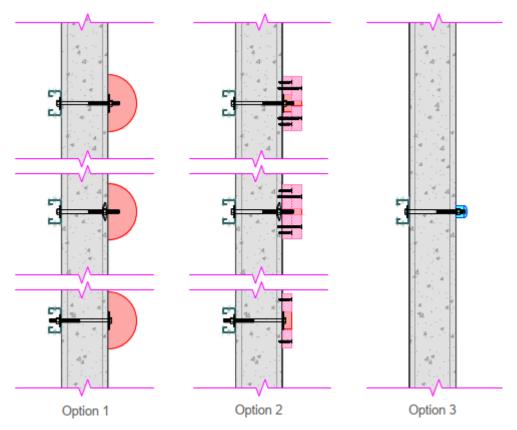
Loading applied to the horizontally installed Speedpanel wall with through bolts
